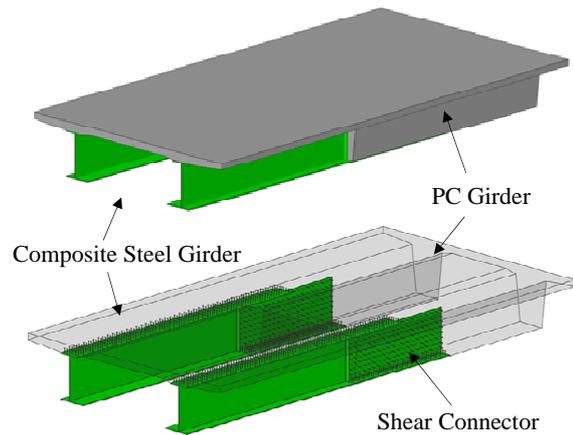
Conceptual Drawing of Joint of Steel Girder and PC Girder using Shear Connector
